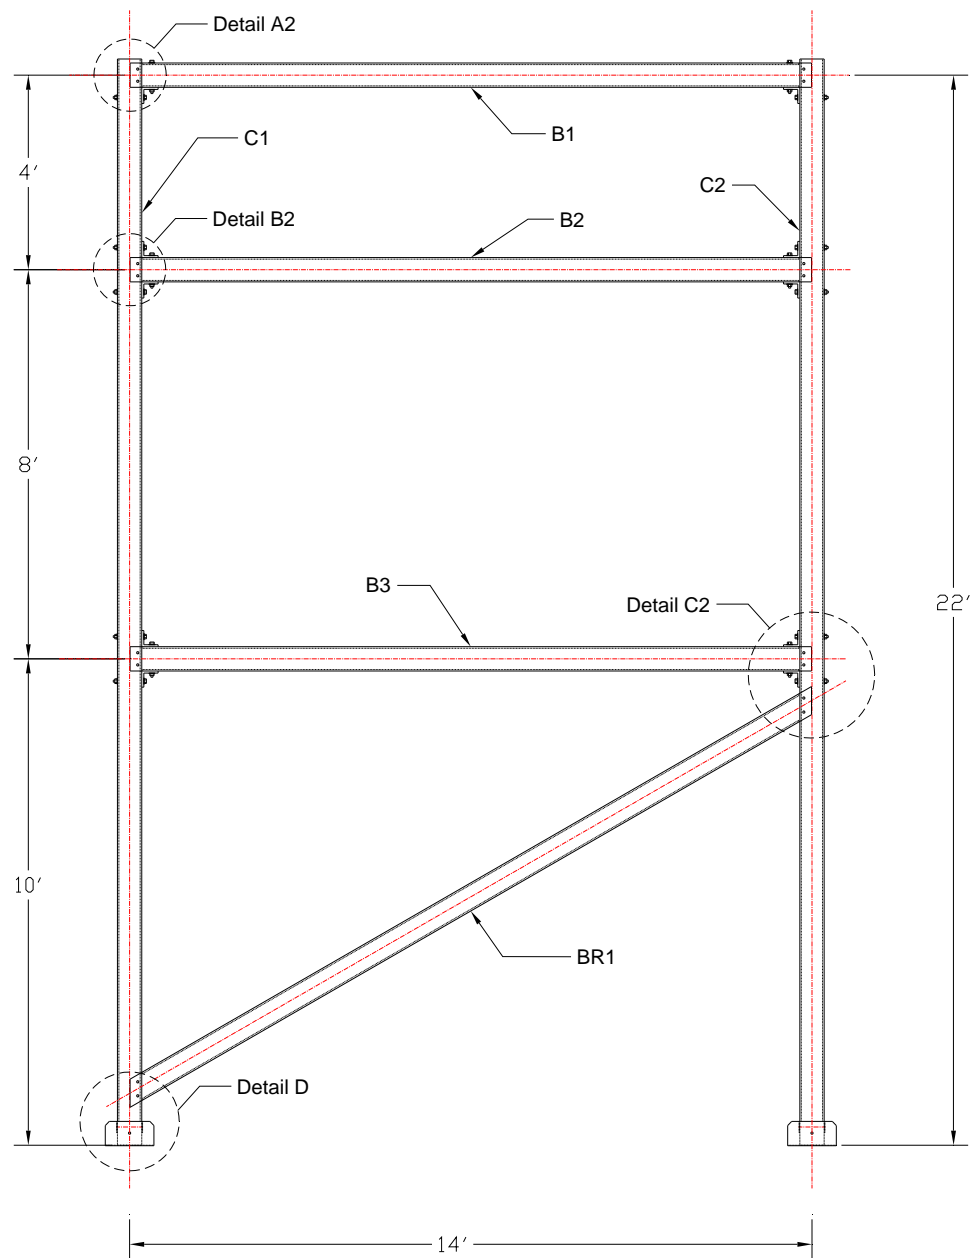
Elevation of the FRAME-1-FA (fixed connection using FRP angles) and FRAME-1-SA (fixed connection using steel angles) with one diagonal member in the bottom story
